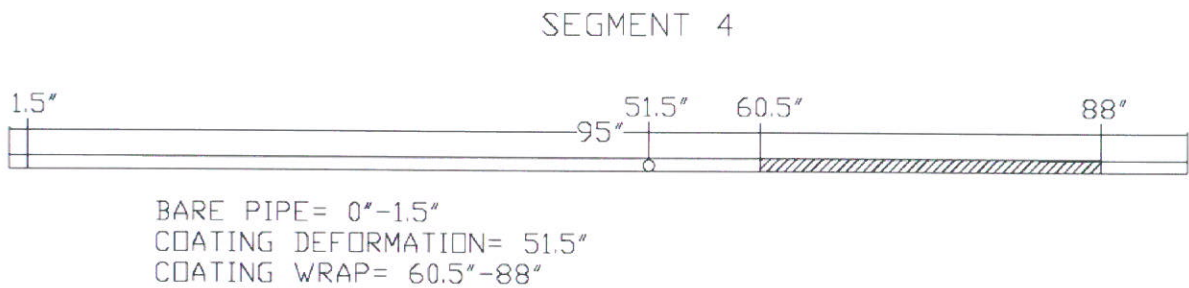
CAD schematic of Segment 4 showing the locations of coating deformations and coating wrap.
